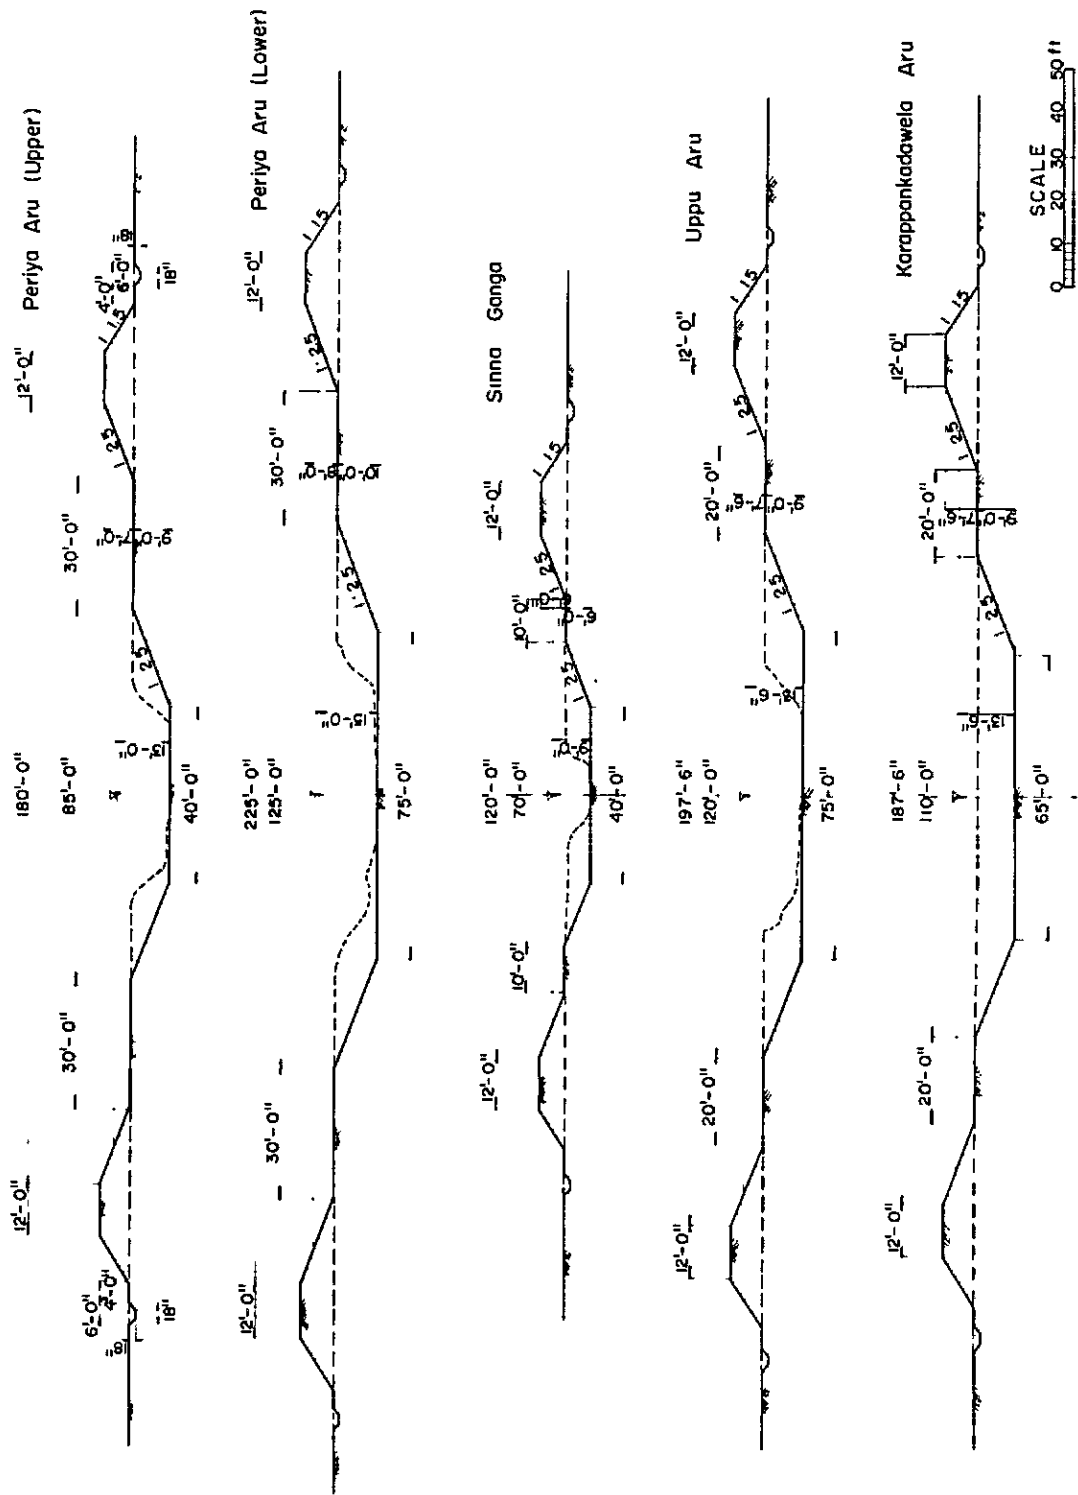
Standard Cross Sections of Ditch Drain & Road
